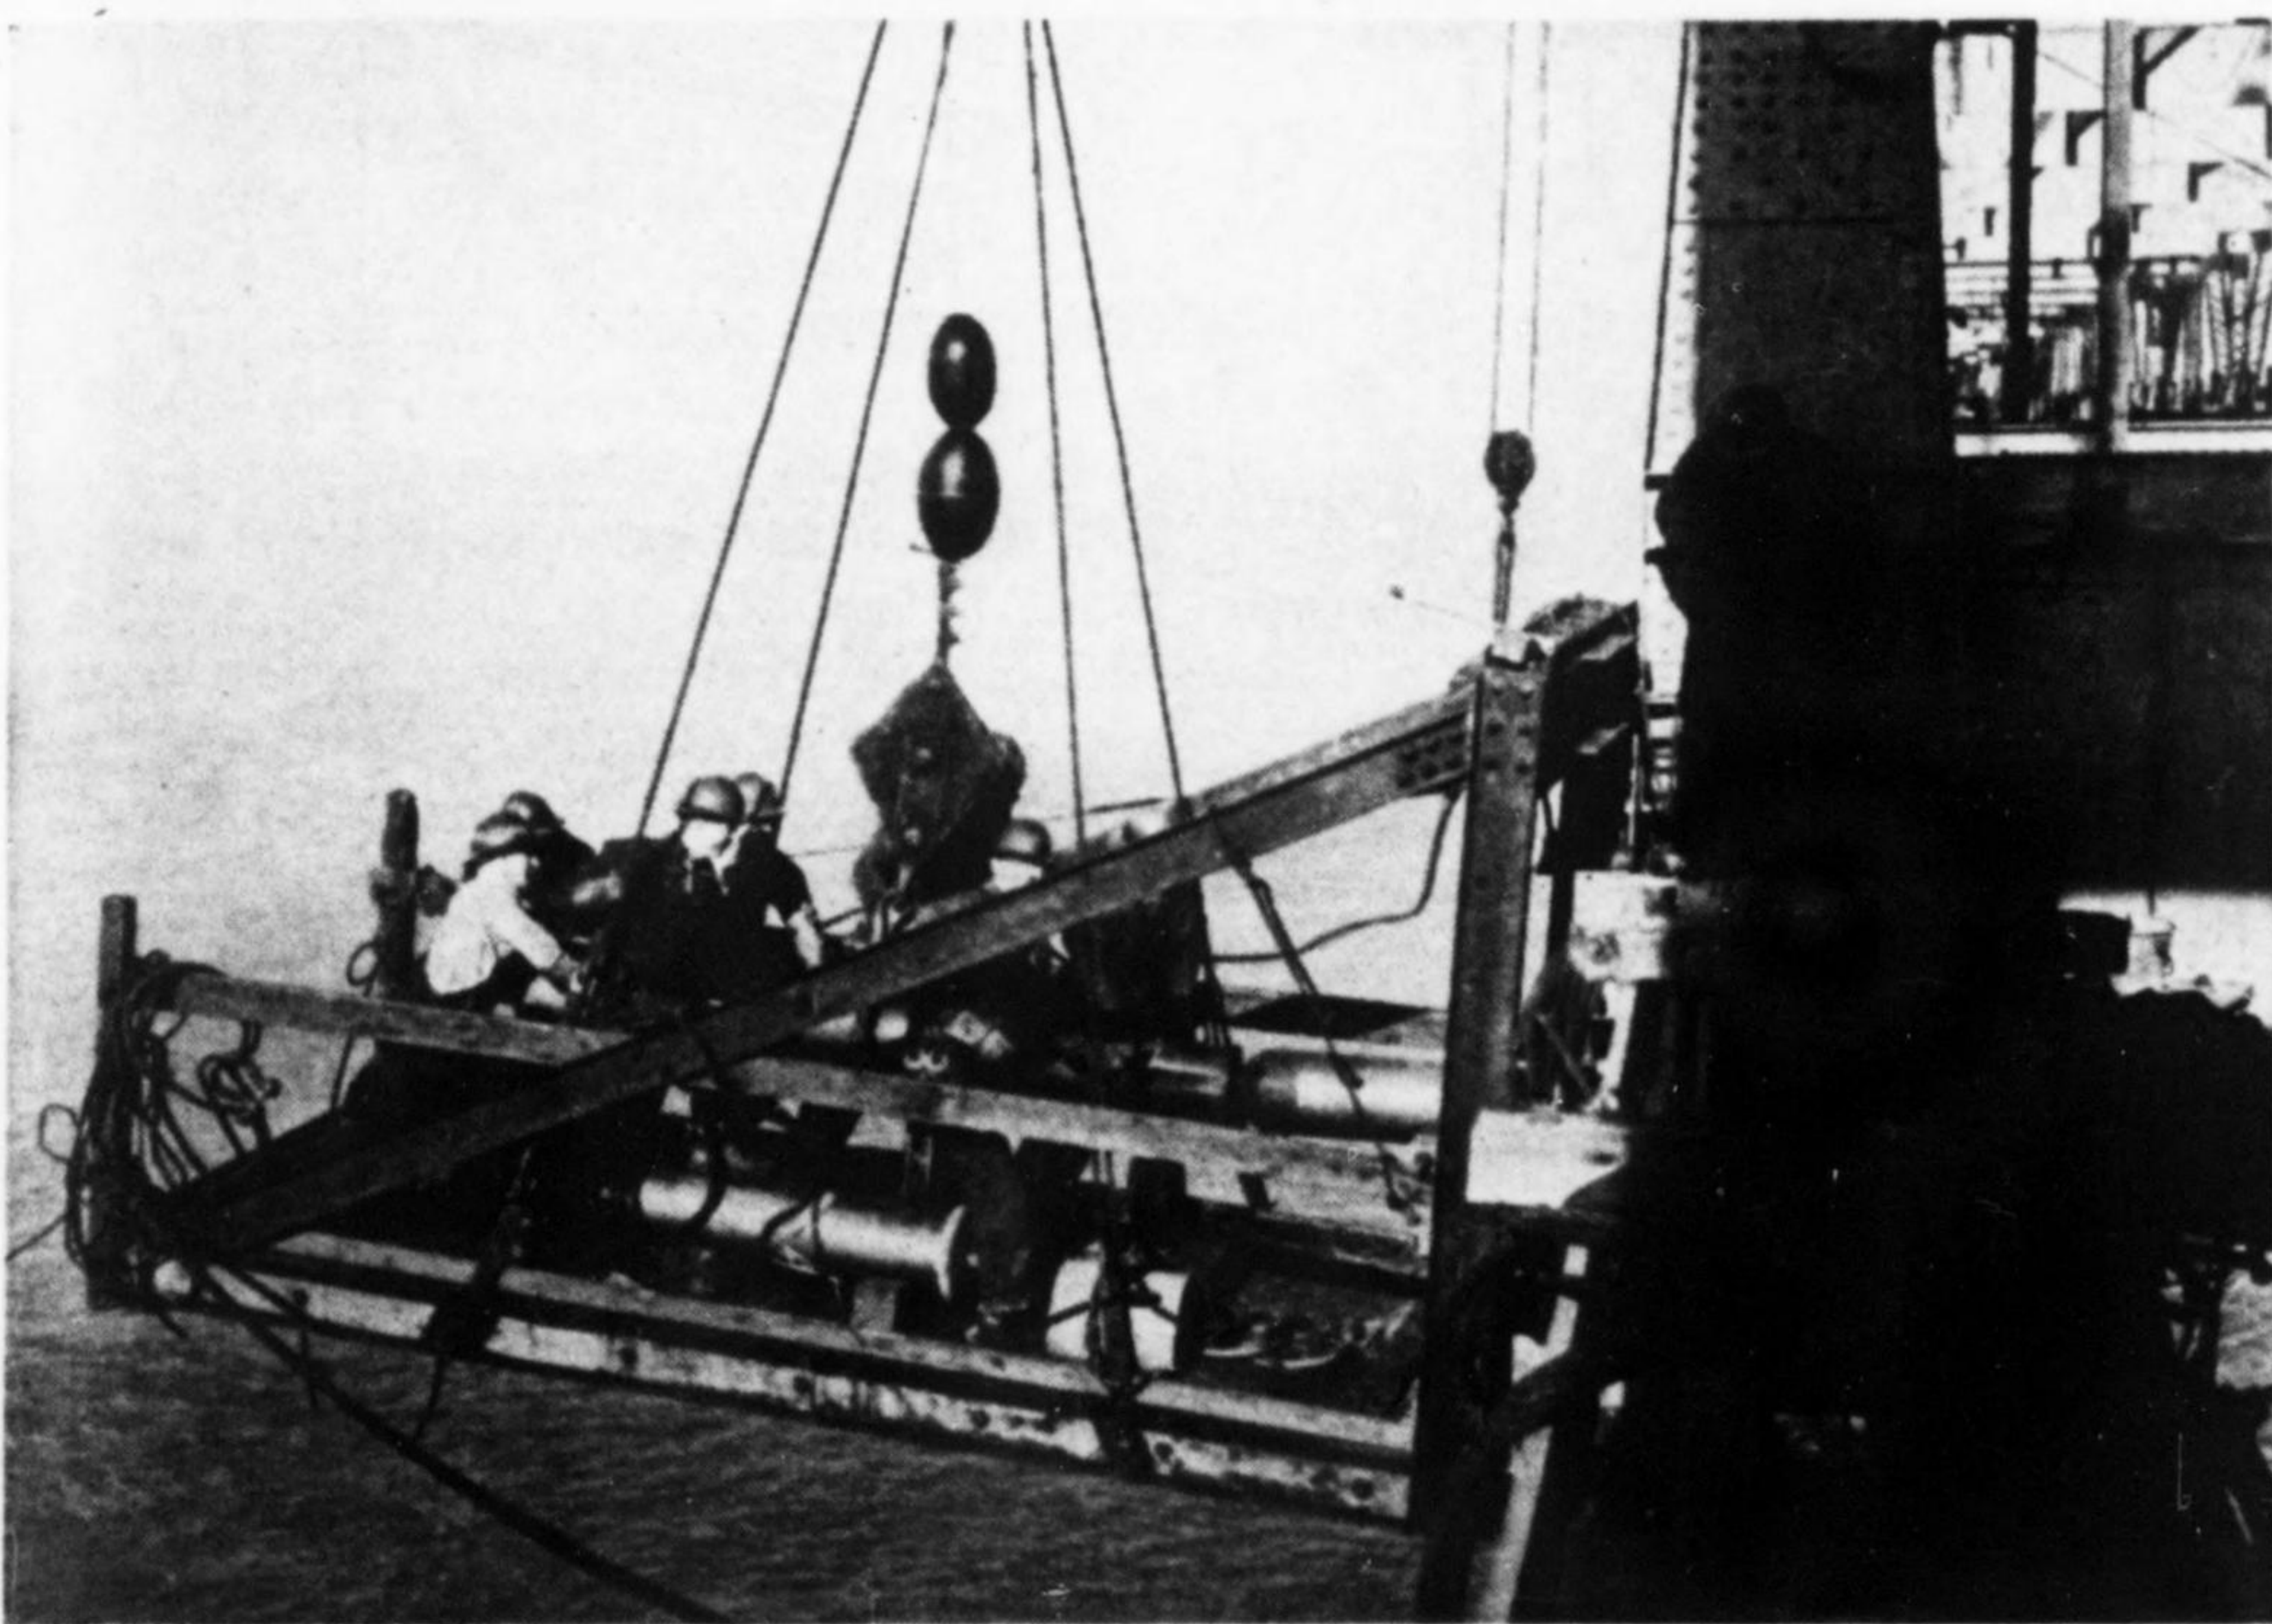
DRIVING the closing pin in the suspended span of the East Bay Cantilever.
